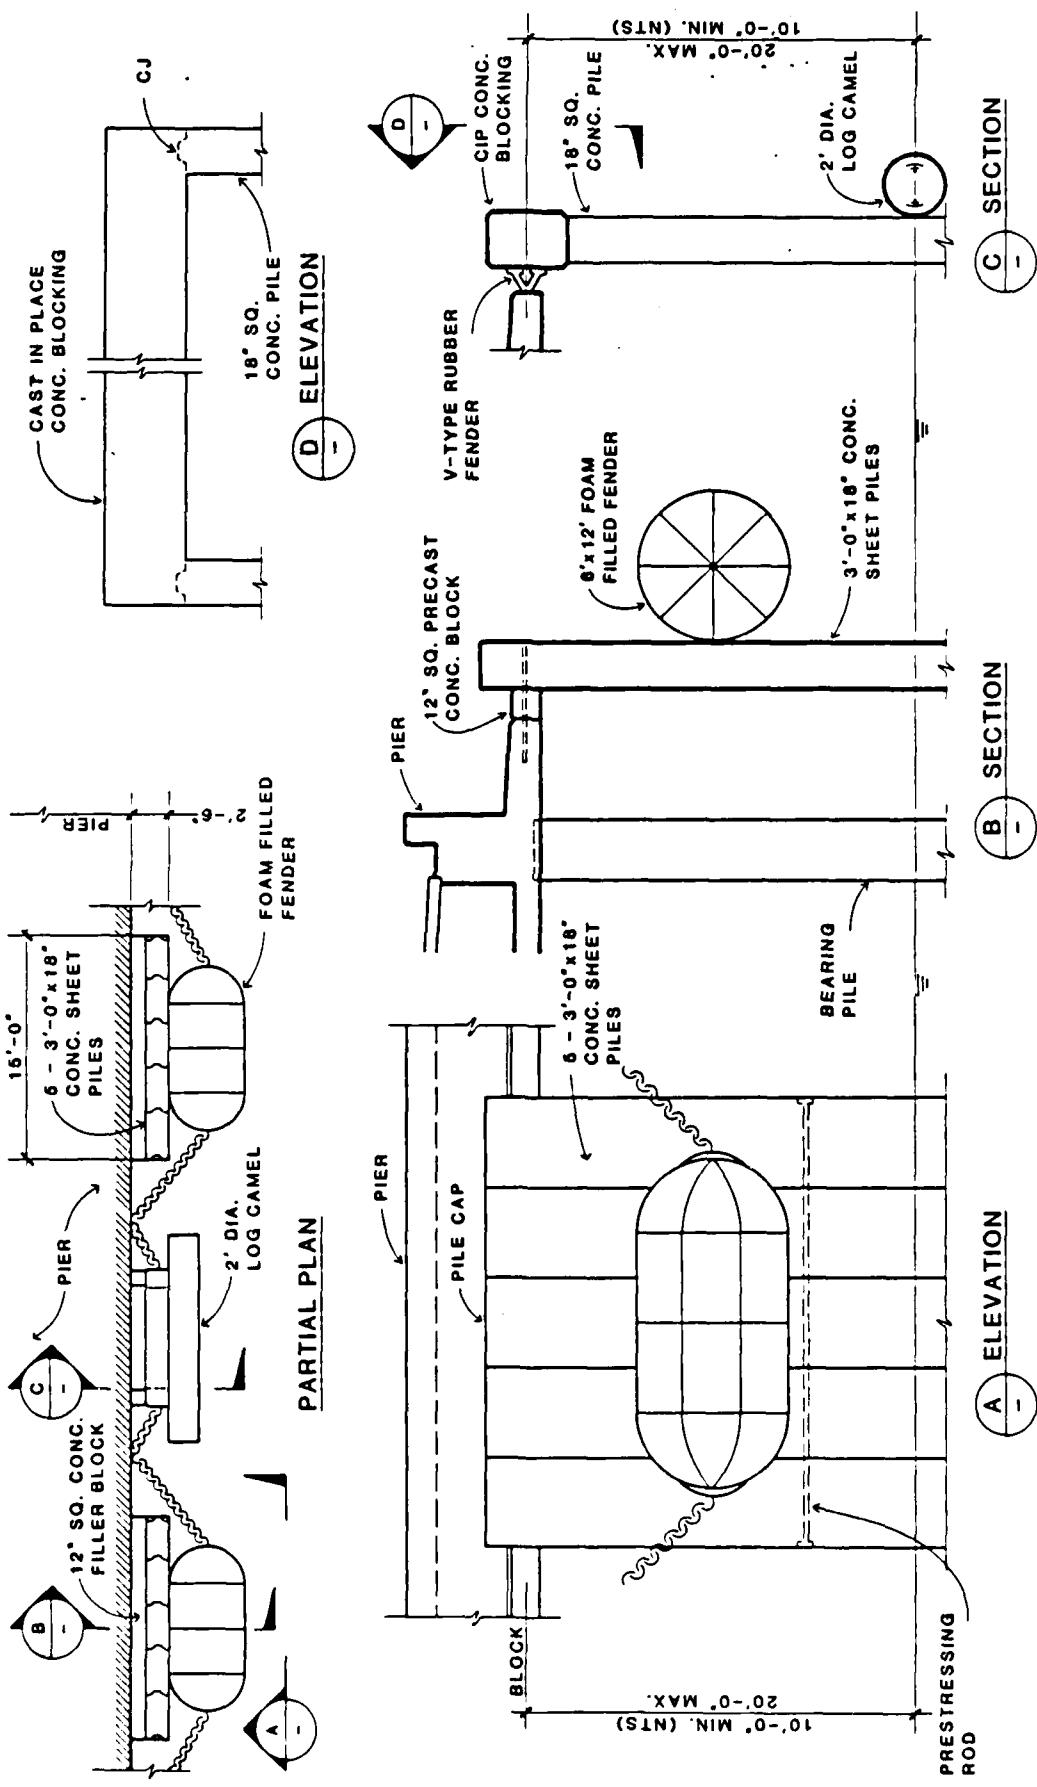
Concrete Fender System Using Concrete Sheet Piles
